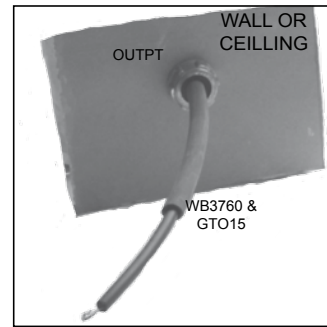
Screw the metallic bushing onto the end of OUTPT. You are now ready to make connection with electrode using either Wetbits short Sleeve Wide or End Cap Wide.
